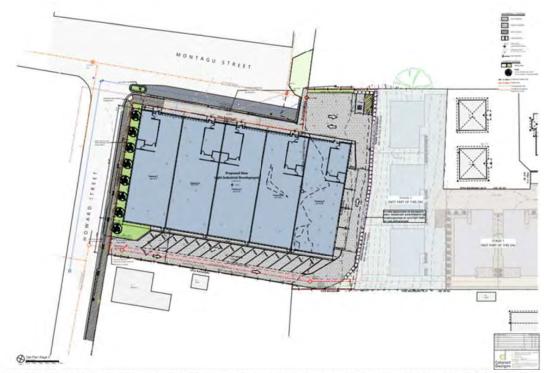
Site Plan (extracted from the proposed plans, which are appended to the planning report, which supports the rezoning and permit application)
